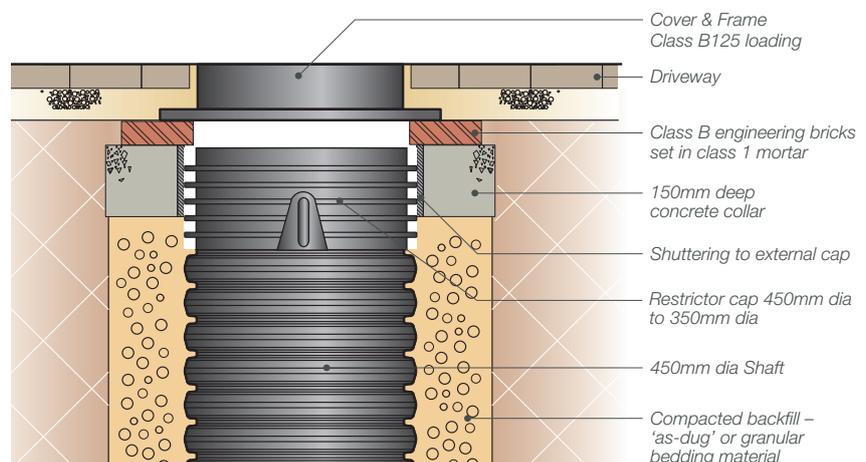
Installation detail B125 loading – paved areas with limited traffic load
